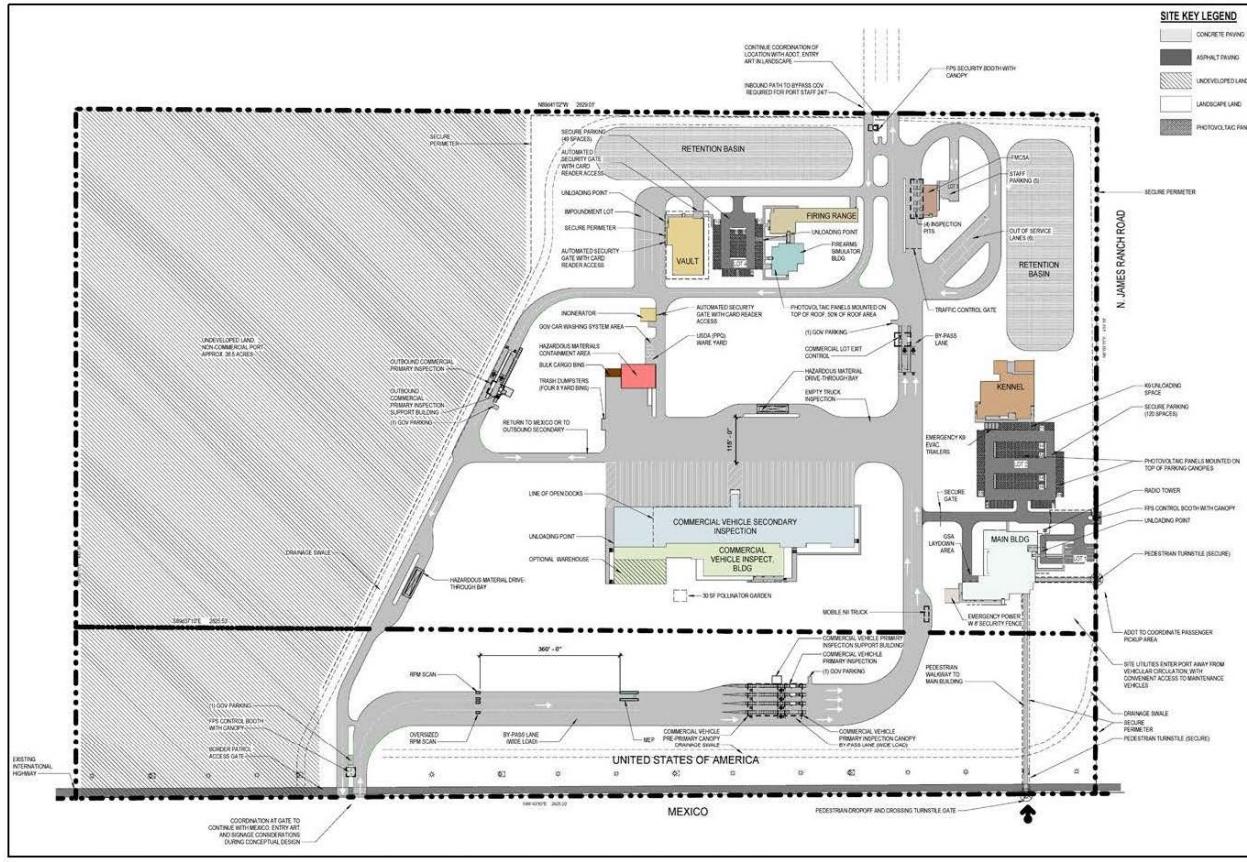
Conceptual Site Layout of the Proposed Commercial LPOE
